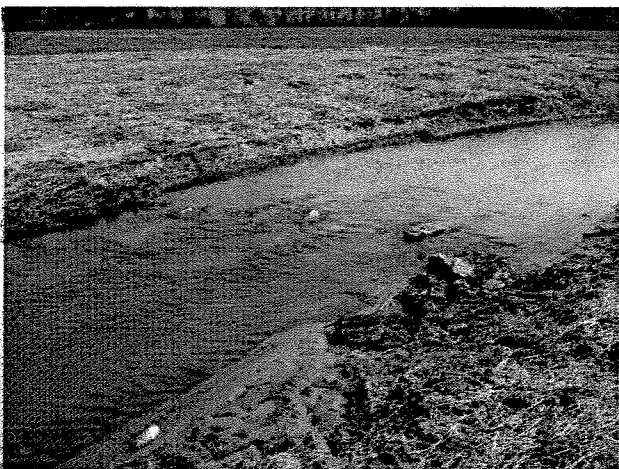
Looking upstream from left bank at log toe protection and root wads installed between MS Stations 14+25 to 13+90. (9/27/04)
